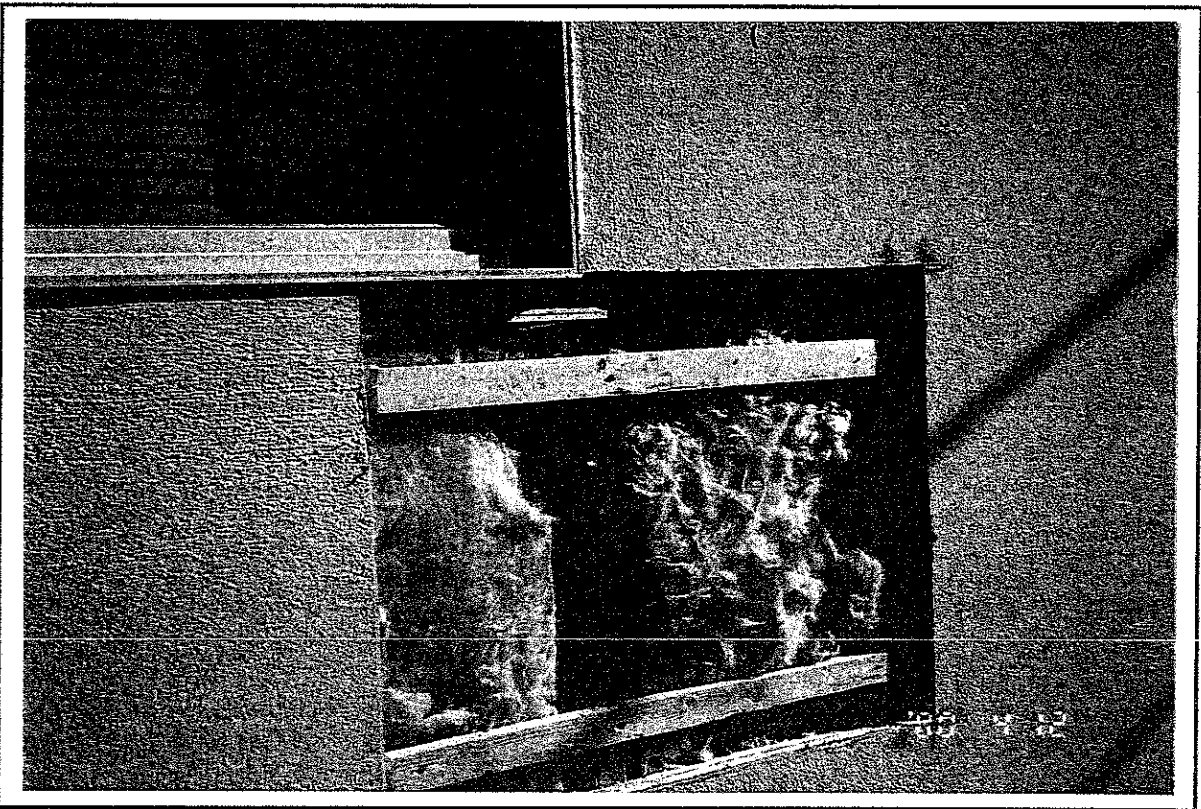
Test Area #14 – Corrosion of steel studs just to East of Test Area #6
